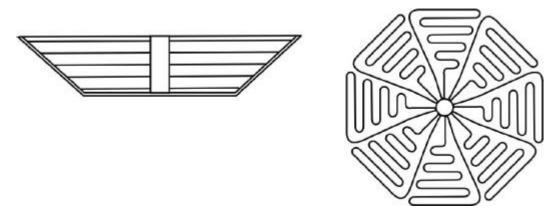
Pit thermal energy storage filled with gravel/sand and water, and heat exchanger piping. Vertical cross section with pipe layers at left, lay-out of one layer of piping at right.
